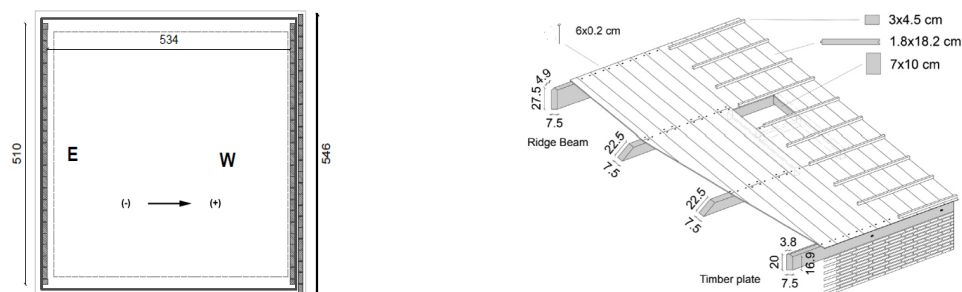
Plan view of the LNEC-BUILD2 specimen (left) and details of roof structure (right) (Correia et al., 2017)
